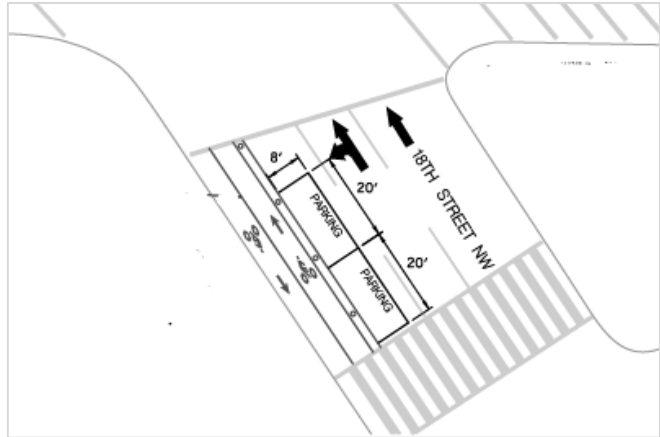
Typical plan view; proposed condition; 18th St NW from Virginia Ave NW to Constitution Ave NW.
